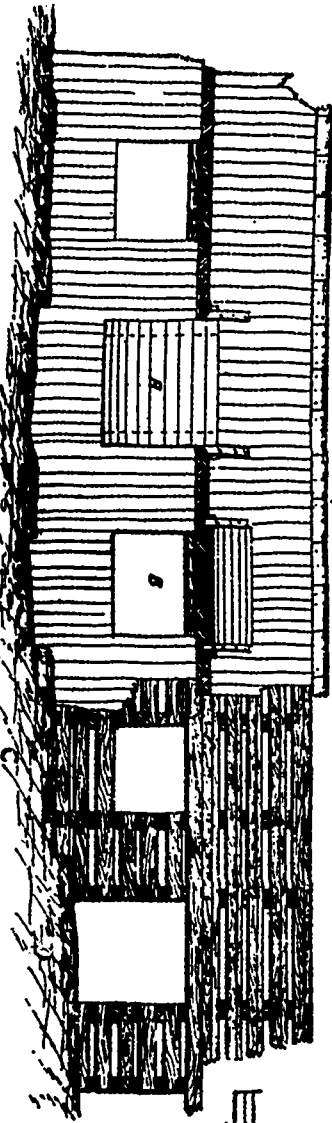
ELEVATION OF FOUNDATION SHALLOW WATER.
